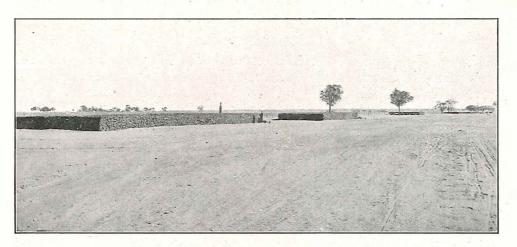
Showing huge heaps of ironstone for construction of Nhill-Kaniva Road, Shire of Lowan.
